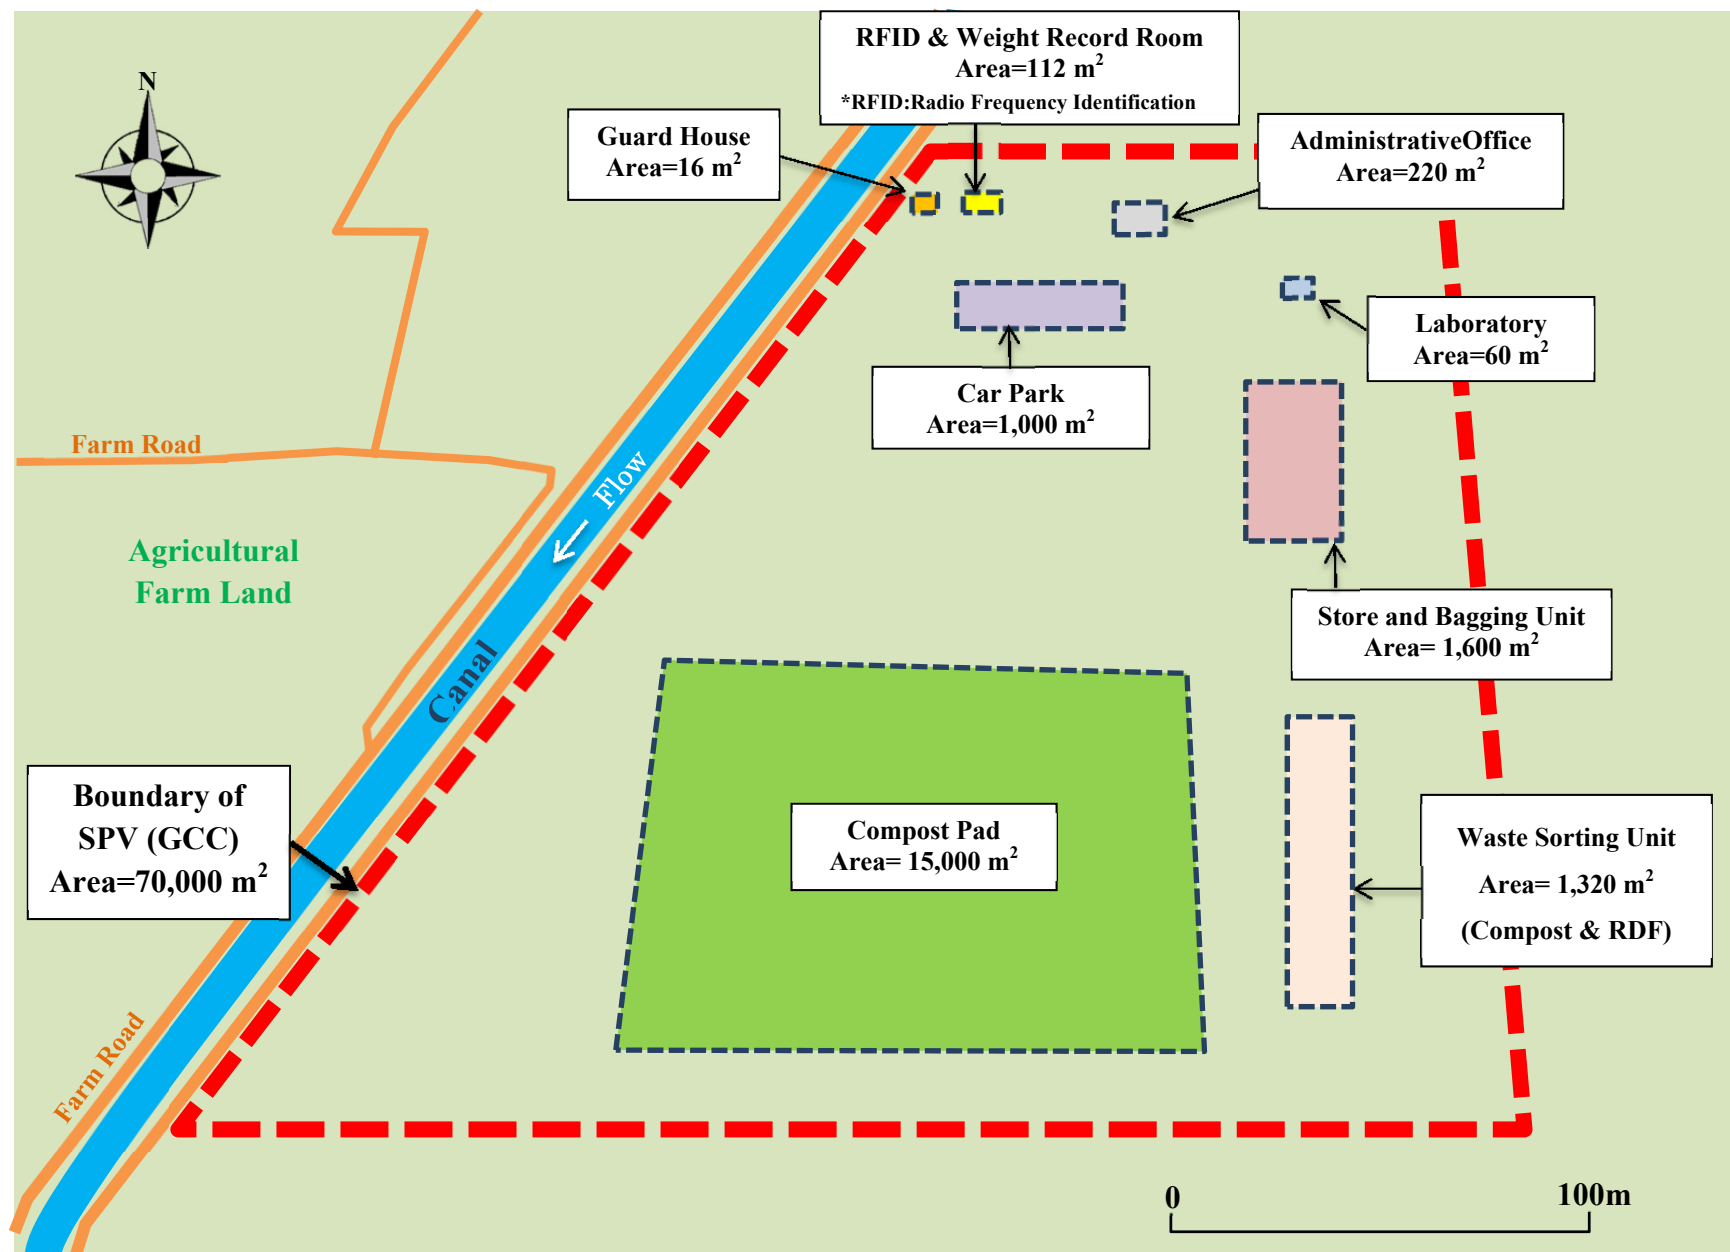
Preliminary Layout Plan of Gujranwala Compost (GCC) Plant
